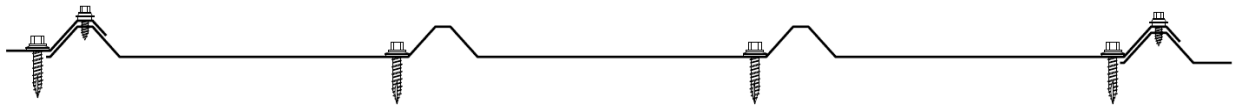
Fastener locations at interior purlins for diaphragms with stitch screws
